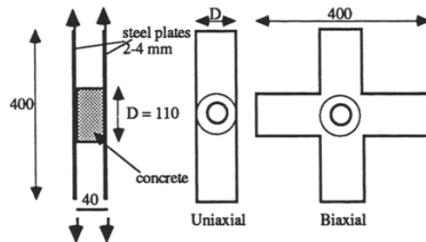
Setup for uniaxial and biaxial tension for controlled specimen cracking, developed by Gérard et al. [54]
